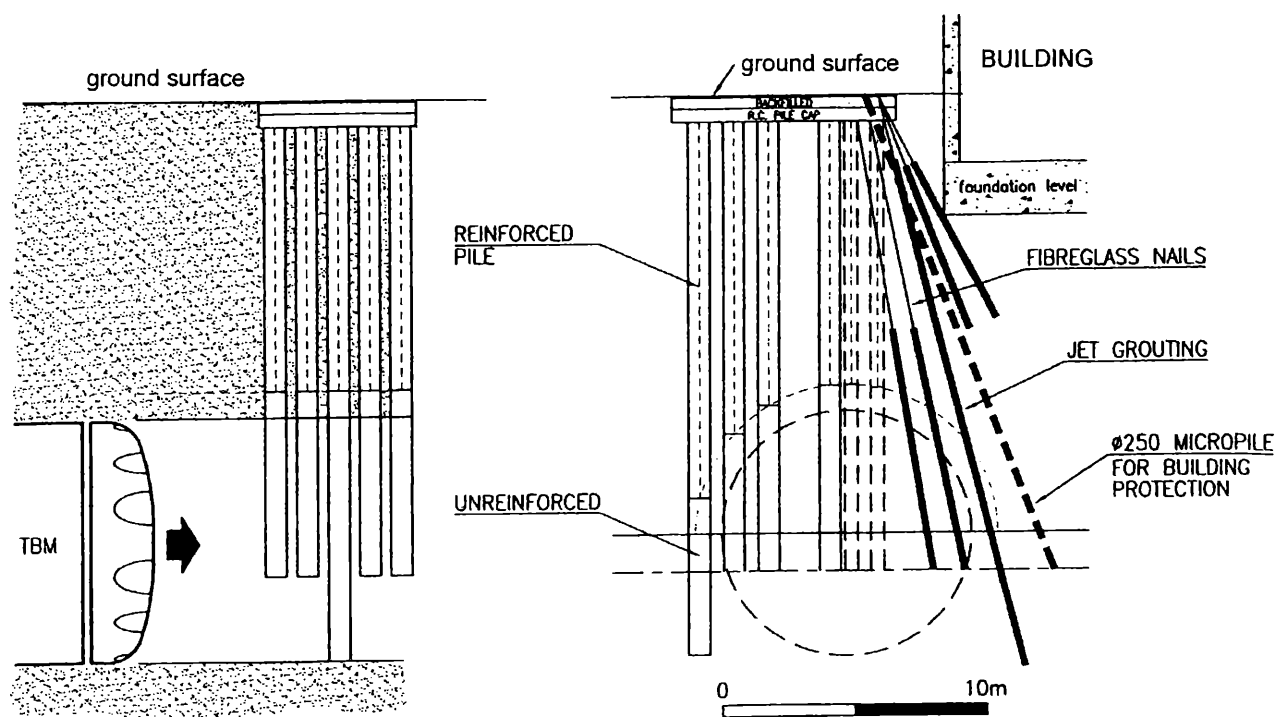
Sections of ground pre-treatment by jet grouted columns and concrete bored piles.
